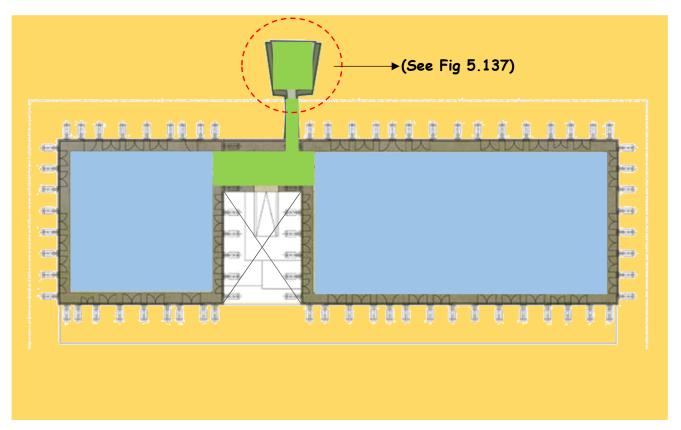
Upper Floor Plan; Prospect and Refuge
